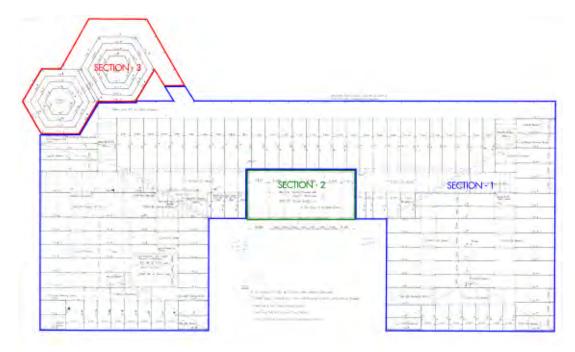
Spinal Injuries Unit – Structural Roof Plan
